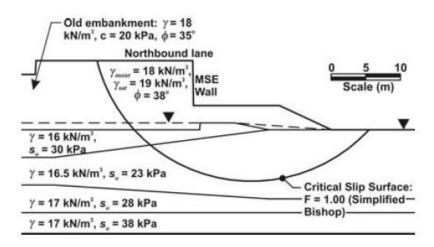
Deep seated failure observed at site KM 18 due to failure of foundation soil (Roy 2008)
